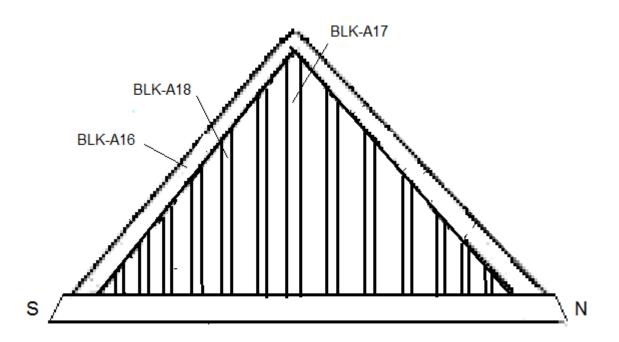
Sketch of truss 8 (hip truss), showing the location of samples BLK-A16–18
